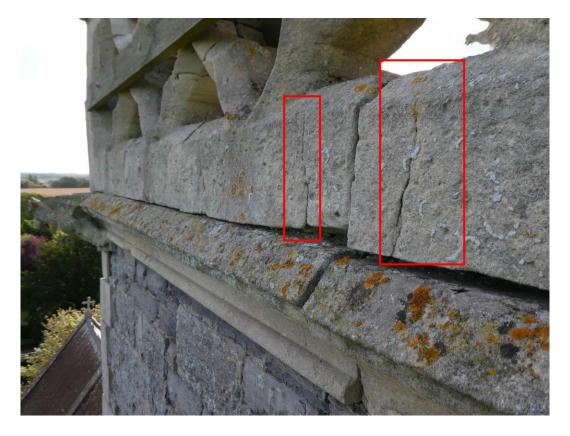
P1000237 Example Masonry Fractures in North Elevation Parapet
